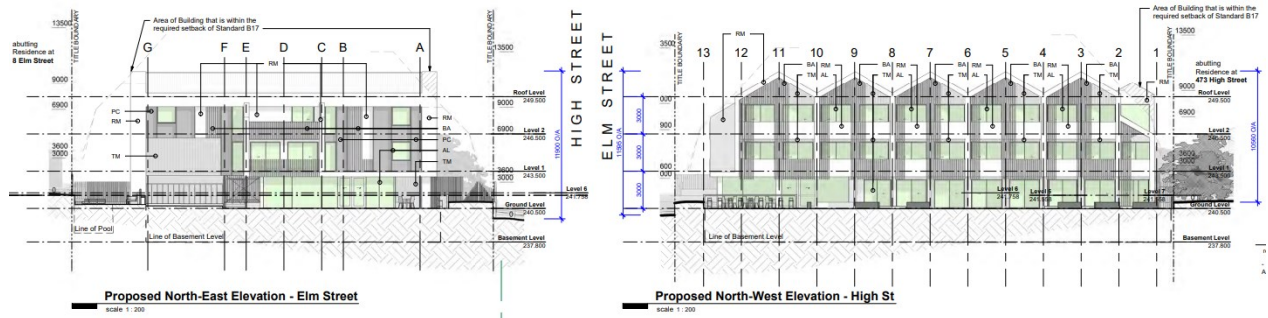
Proposed north east (Elm Street) and north west (High Street) elevations
